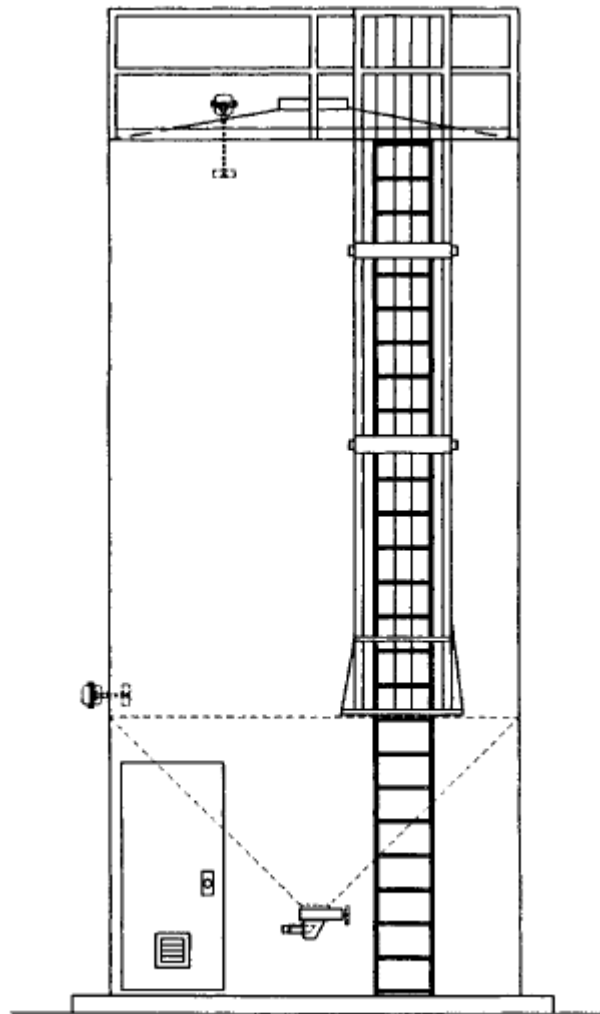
A 12-ft-diam welded steel silo.
